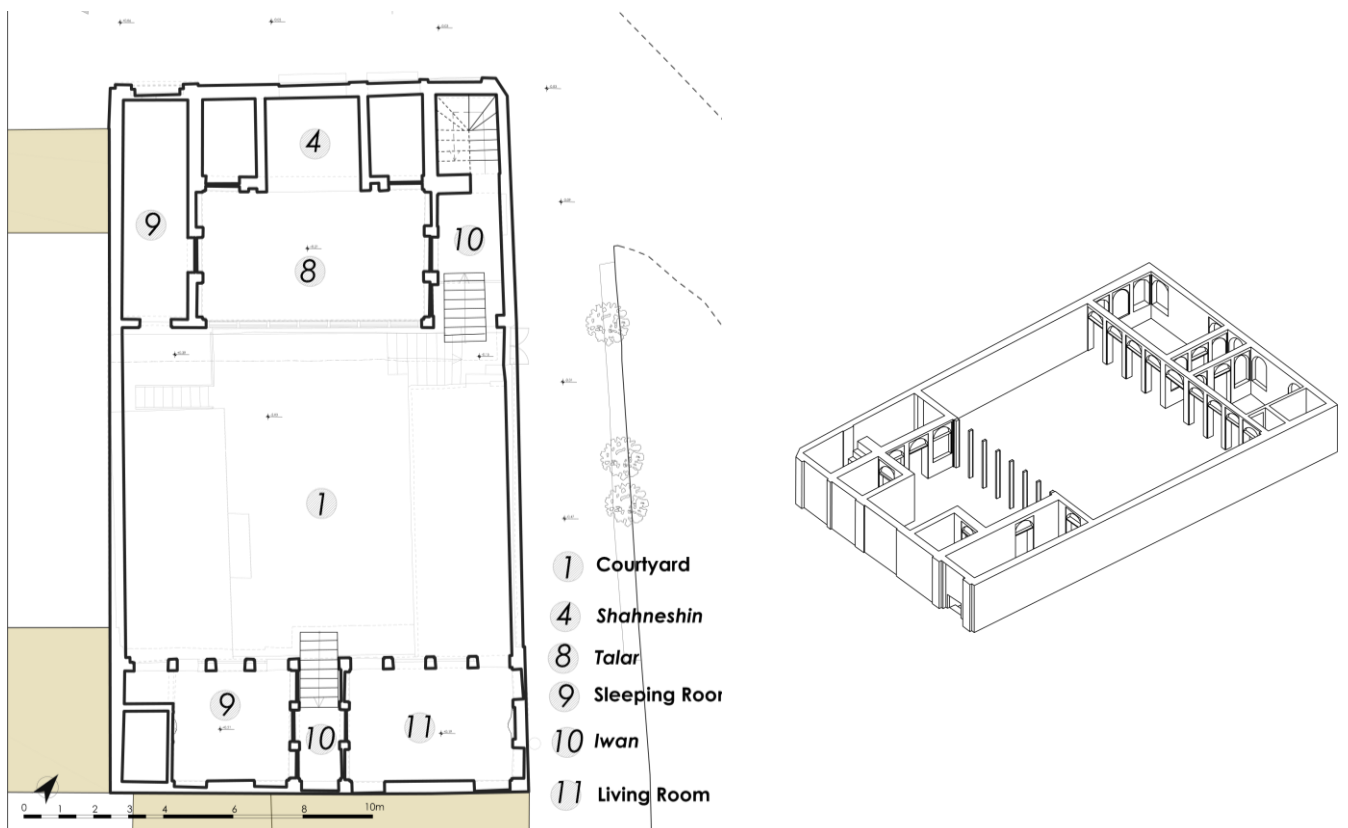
The image depicts the earlier plan of the first floors of both building masses in which spaces are identified.
